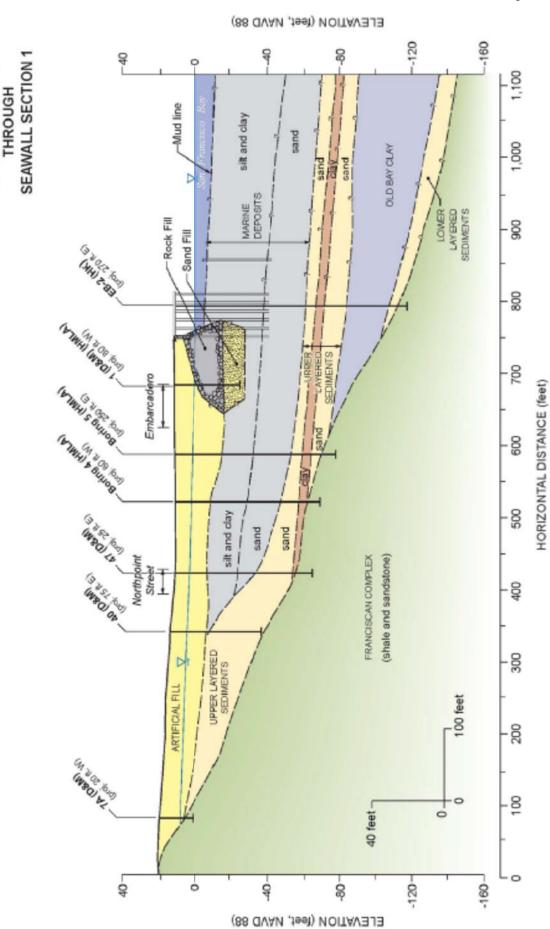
Exhibit C: Seawall Sections (2 of 8) Historic Section 1 - Vicinity of Pier 39
